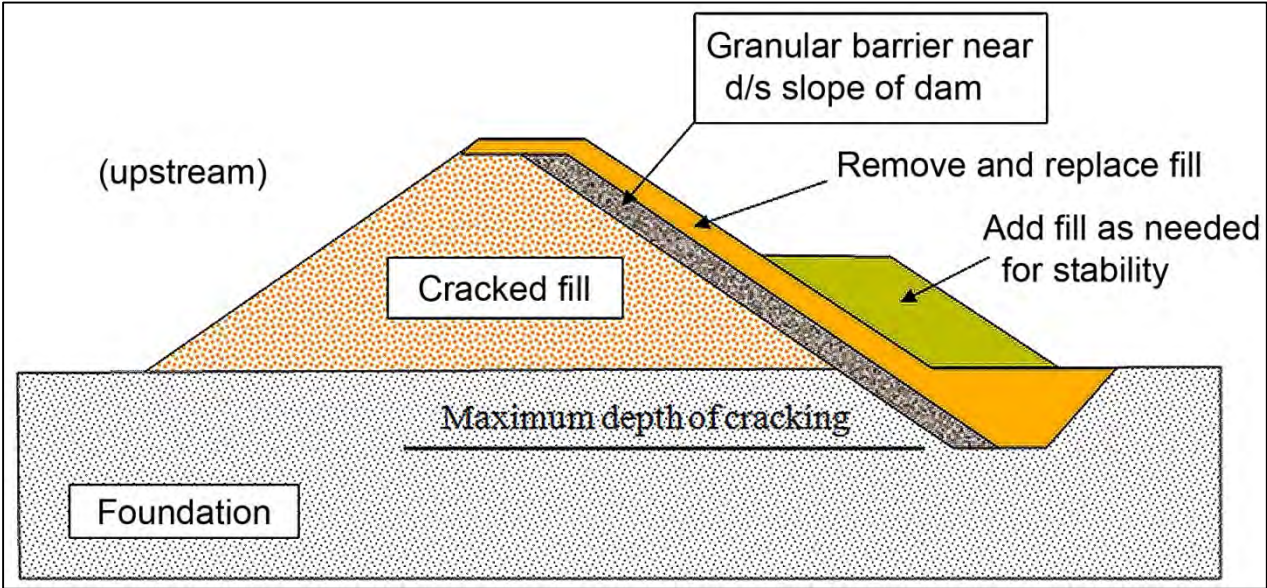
Inclined granular barrier near downstream slope of a cracked embankment in a normally dry dam.
